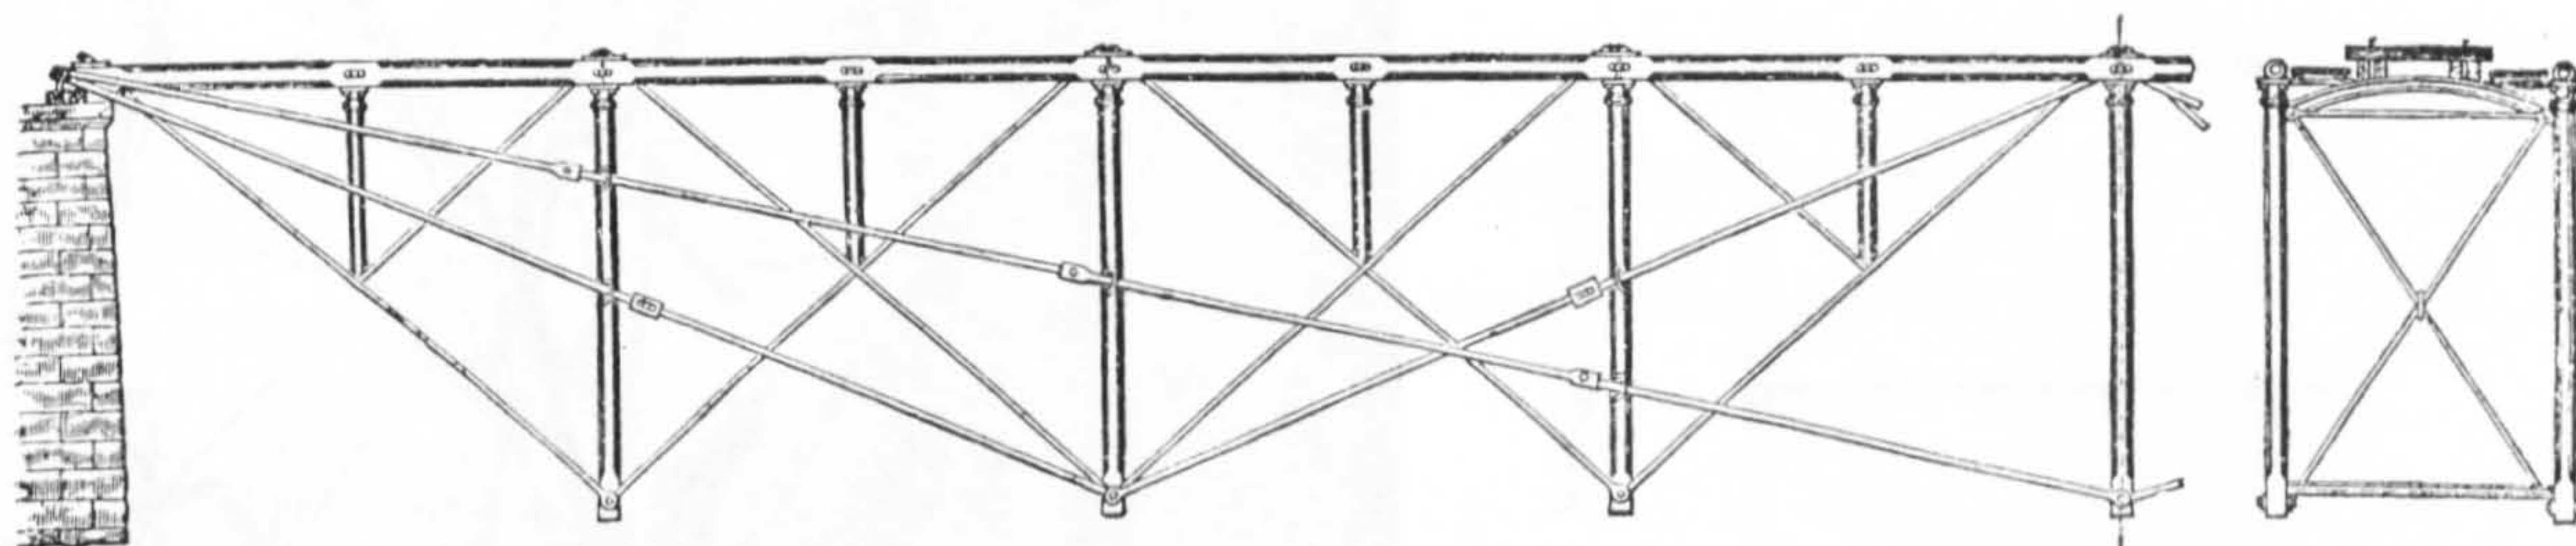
Wendell Bollman's truss arrangement. (Merriman & Jacoby, 1913)
